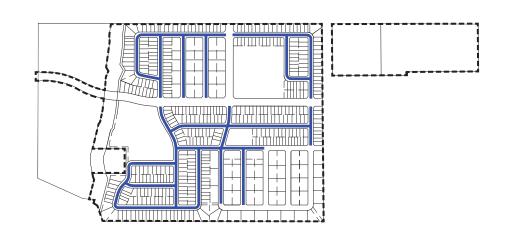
Local Road (Typical 16.5m ROW - Area 2)
